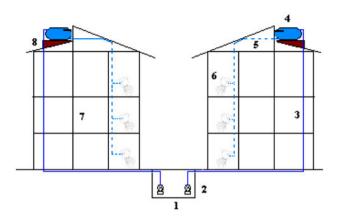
(1) Underground storage tank 60 m³, (2) submersible pumps, (3) pipe connections, (4) elevated storage tank 2 m^3 , (5) pipe connection, (6) flash toilet reservoir, (7) multi-storey buildings and (8) support for elevated tank.
